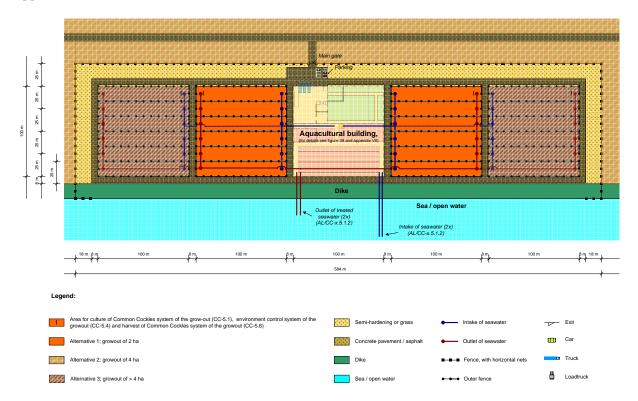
Floor plan of the physical architecture of the aquacultural site at system level.
